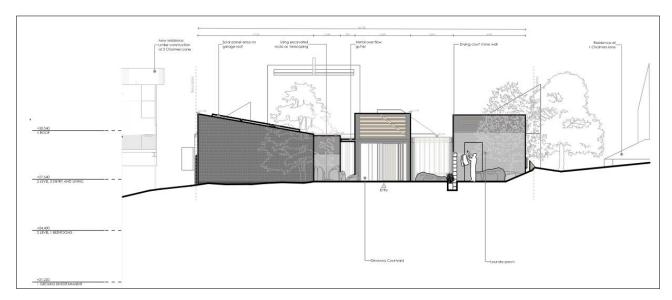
Southern elevation (Source: fitzpatrick + partners architects)
